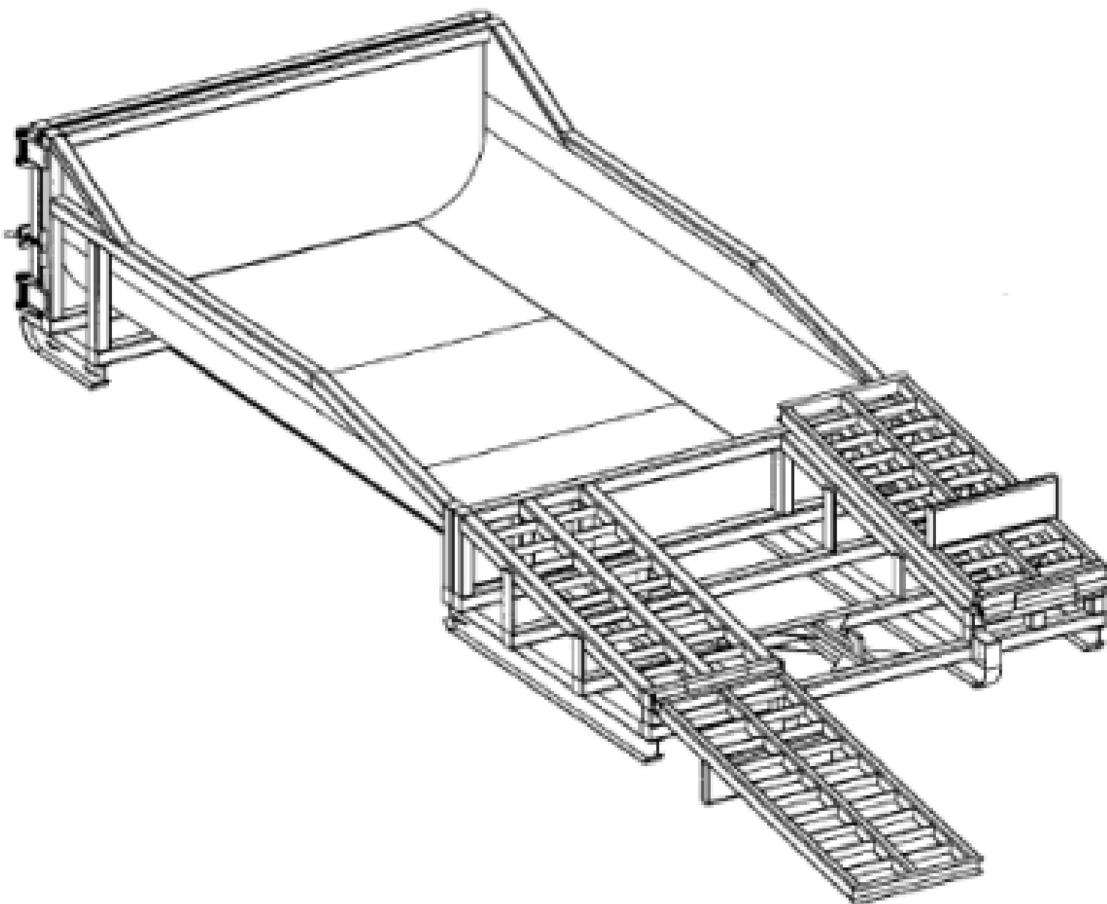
Prefabricated Concrete Washout Container w/Ramp
